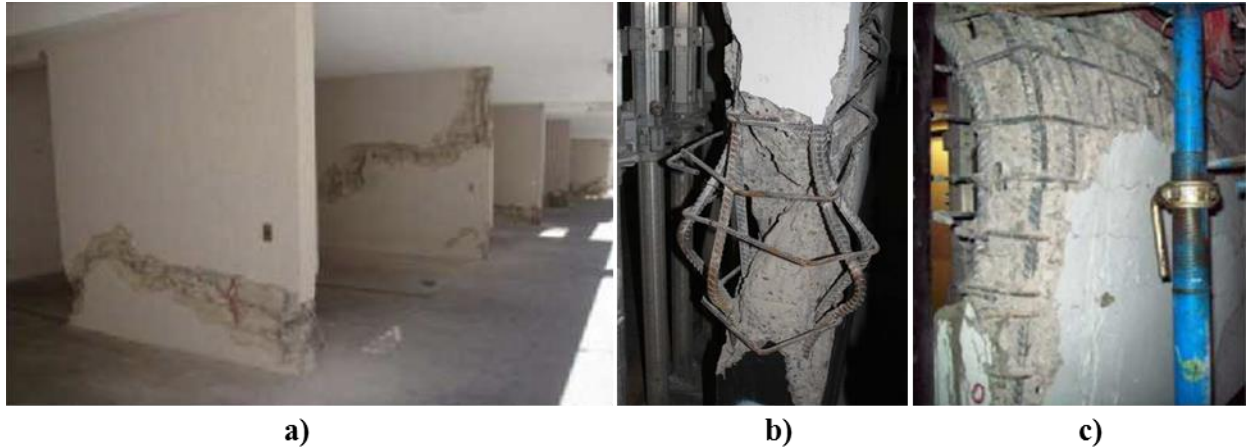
Observed damage to shear walls in Chile: a) Concrete crushing, b) Rebar buckling, and c) Lateral (out-of-plane) instability, Images: Wallace et al. (2012)
